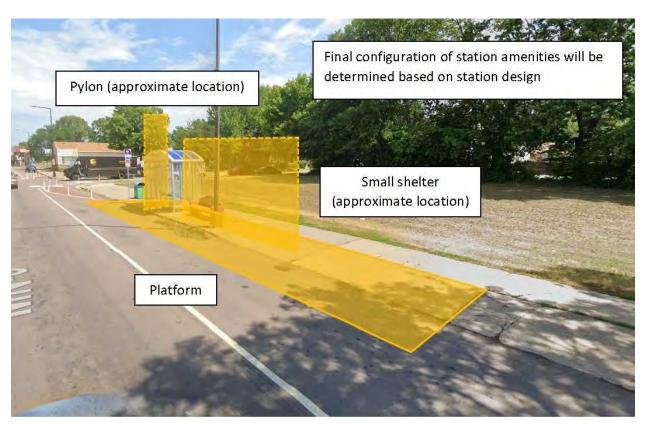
Robert Street South and Isabel Street East proposed northbound platform in area of the Isabel.
